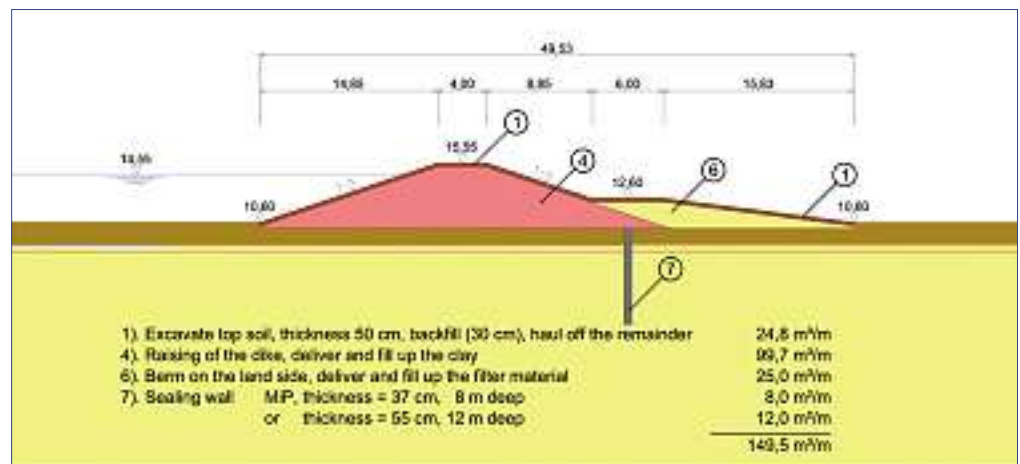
Alternative dike construction with sealing wall (Hondsbroeksche Pleij)
